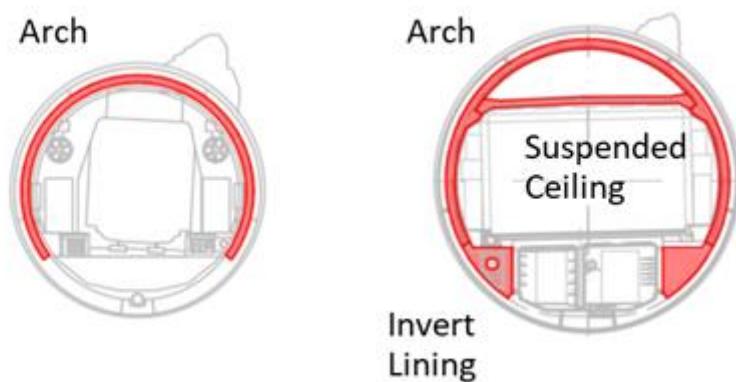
Typical inner linings in mechanised tunnelling (source ILF)
